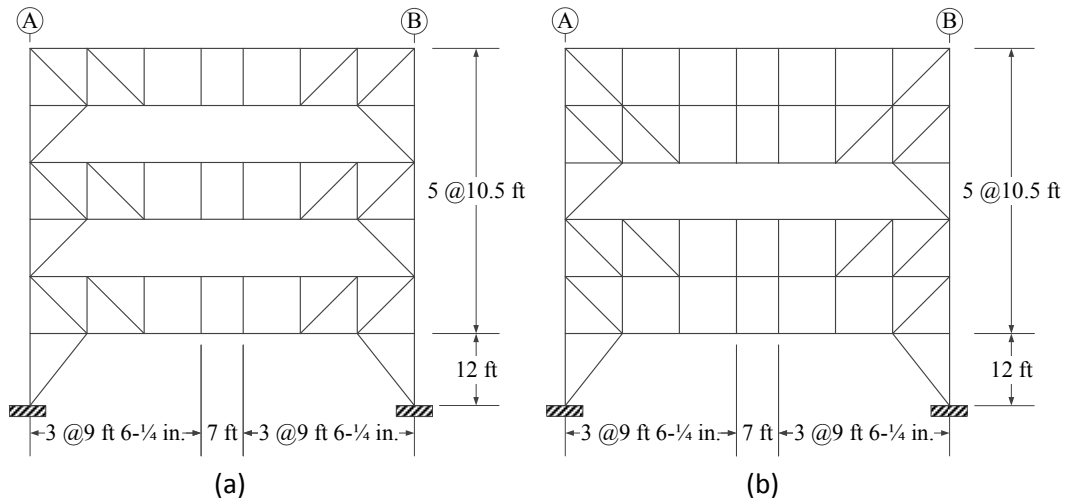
Structural geometry of the 6-story STF system (kickers): (a) elevation view of odd bay; (b) elevation view of even bay.
